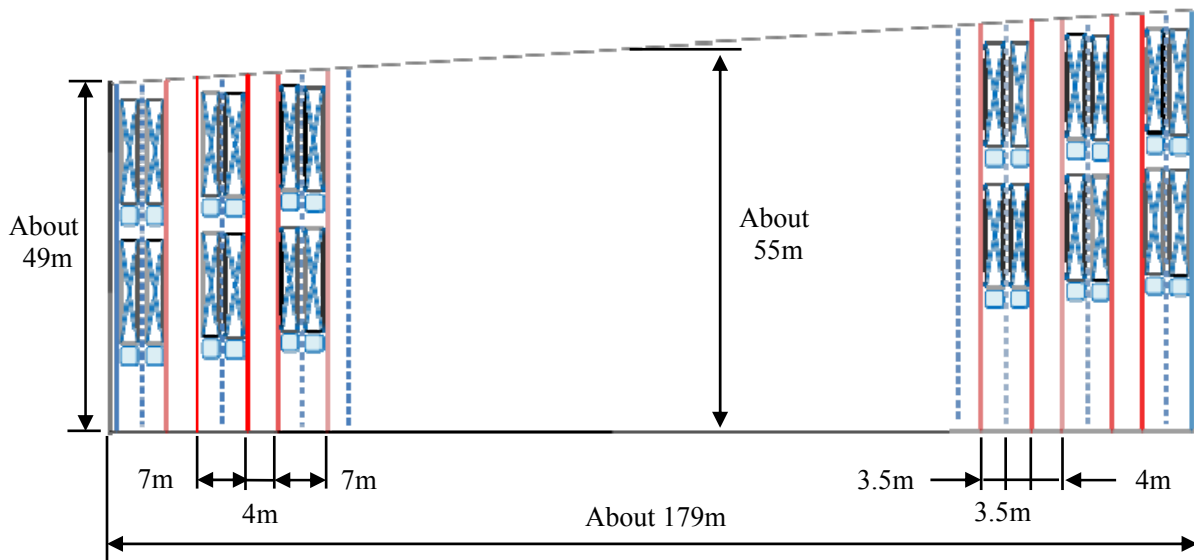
Arrangement of trucks from Mali and trucks inside the port (draft)
